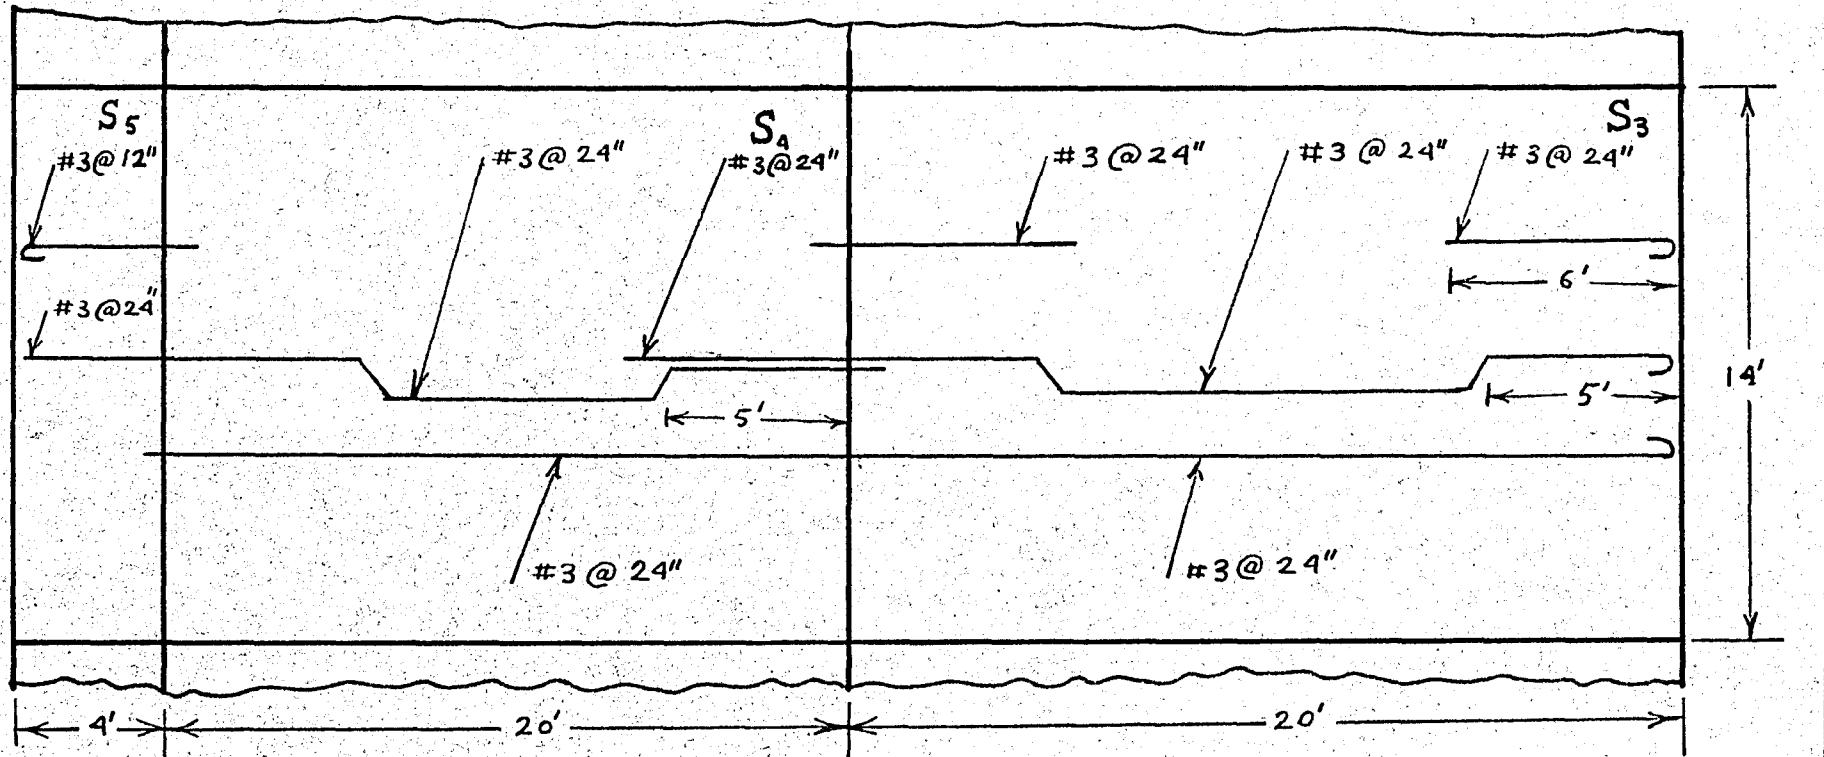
S₃, S₄, and S₅ Steel Reinforcement
